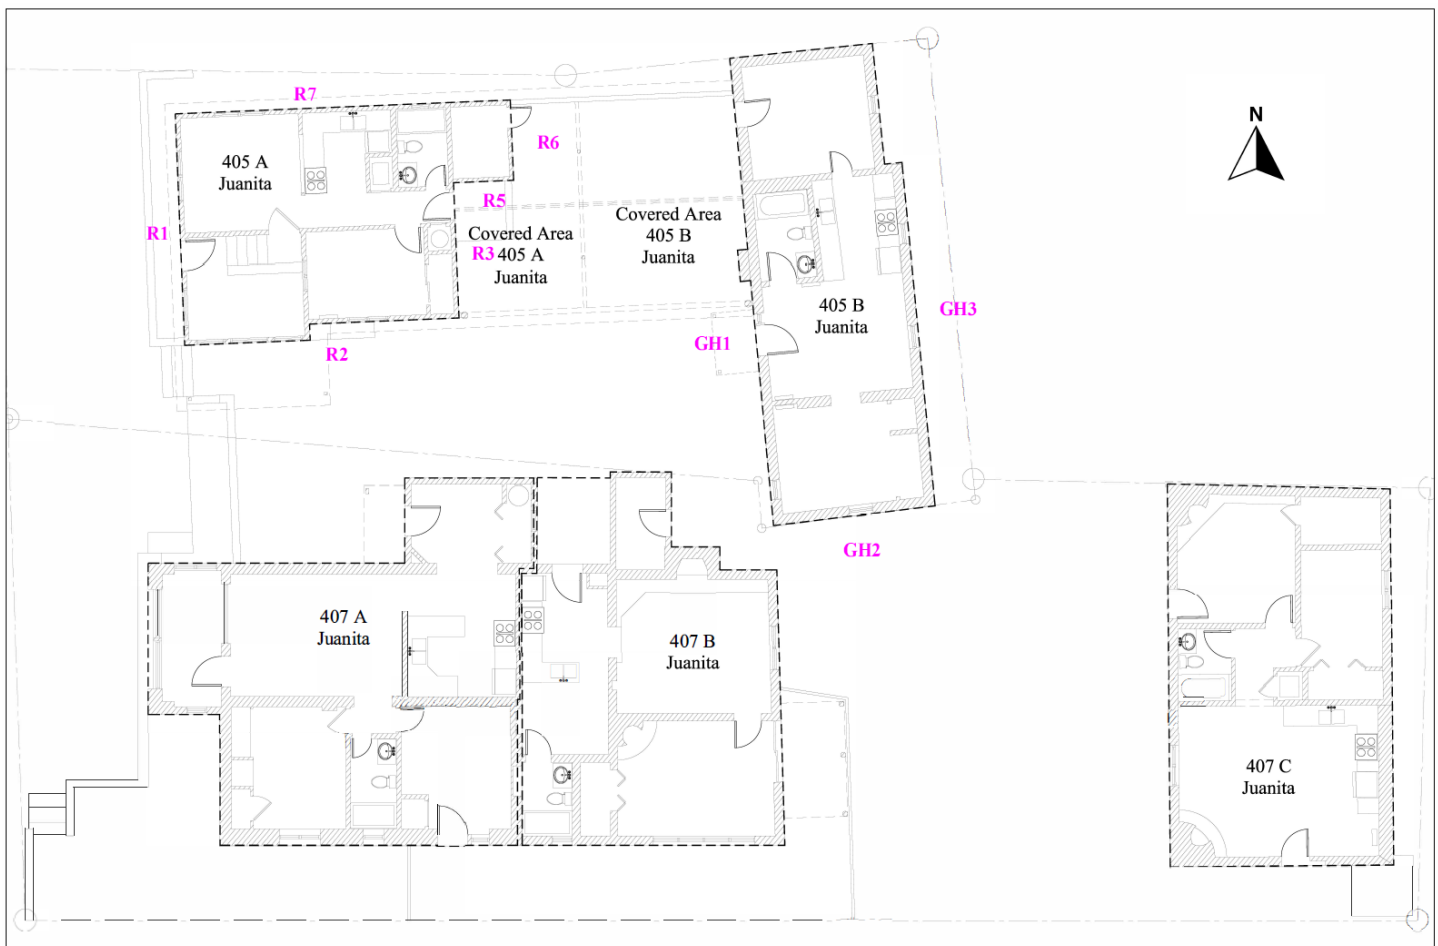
Site map with facade designation. Note: 405 B does not have facade number for the north elevation as it is a shared wall with the neighboring property, 824 Agua Fria Street.
